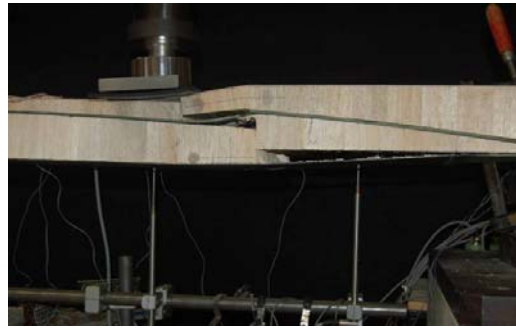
Typical failure mode of arch beams (beam A-G-2 is shown)
